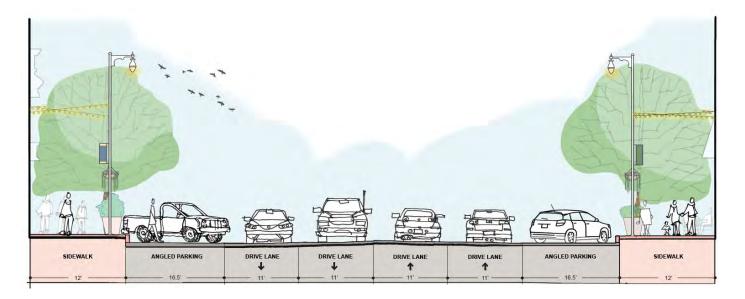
Secondary Street Section Option 1* and *Figure 4.5 - Secondary Street Section Option 2* illustrate two different options for a section of Broadway between 2nd and 3rd Streets.
